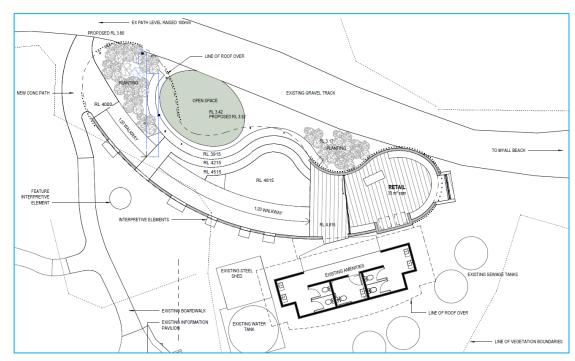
EKY VISITOR CENTRE FLOOR PLAN (DAINTREE NATIONAL PARK)
